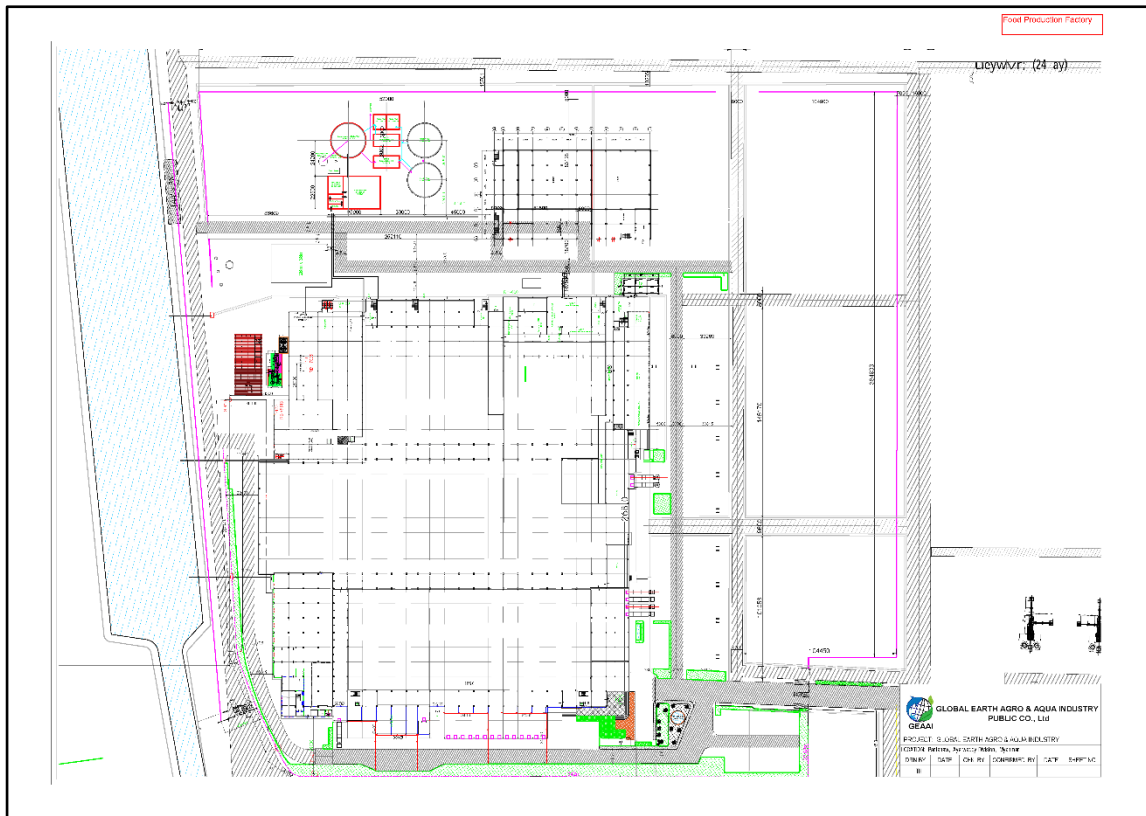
Layout Plan of Processing Plant and Cold Storage
